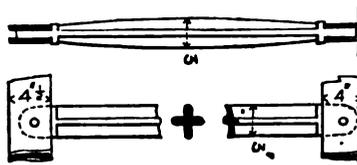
Front and Side Elevation of Vertical Struts, or Intermediate Standards, to 72-foot and 48-foot Trusses.
